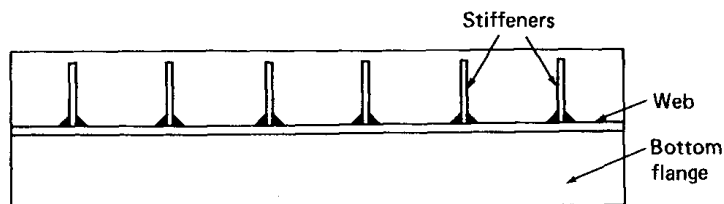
Horizontal section of a plate girder with stiffeners placed on one side
